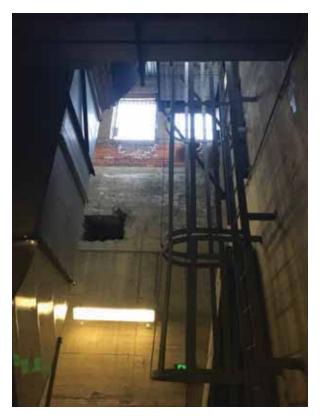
Roofed areaway (former ice storage tower) from sub-basement to rear parking area
